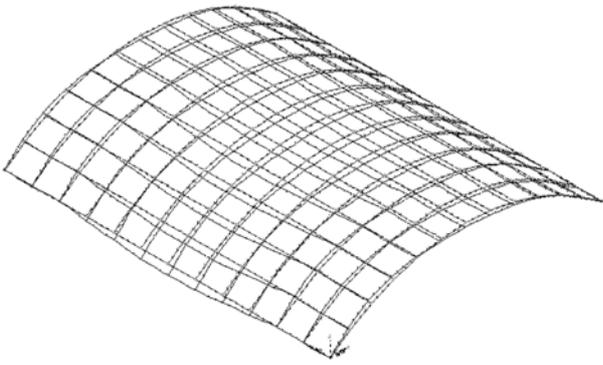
The undeformed and deformed shape of the B2 barrel vault under S543 settlement.
